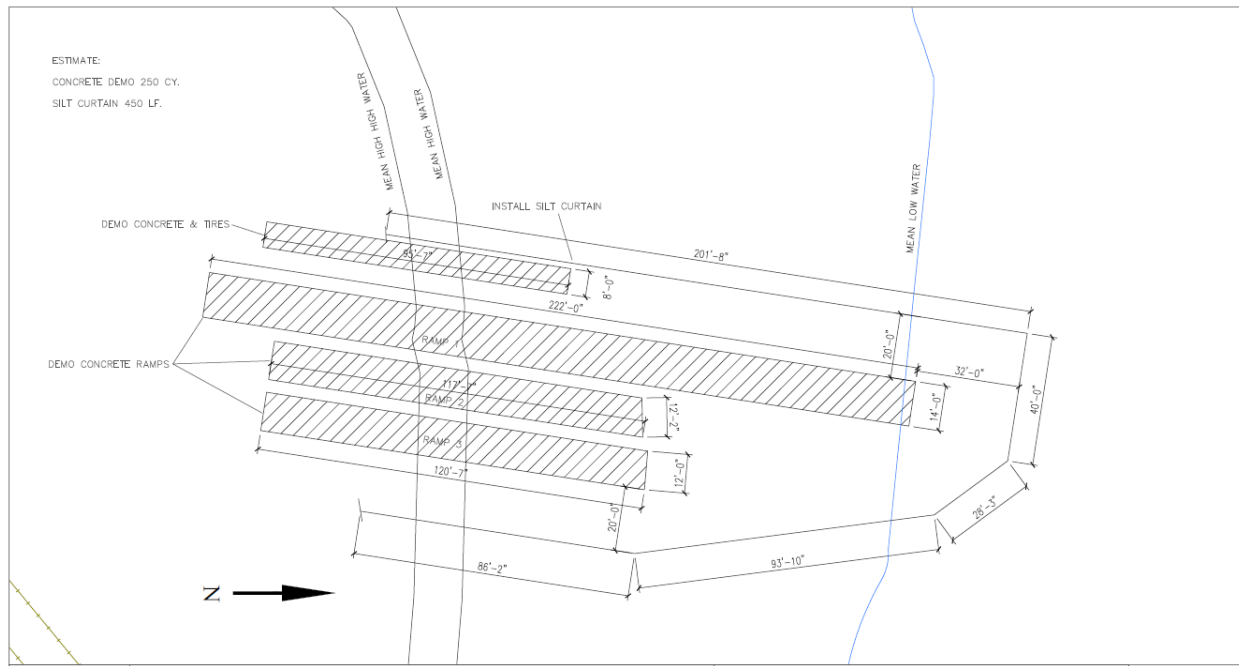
Plan view of existing boat ramps and concrete tires to be demolished
